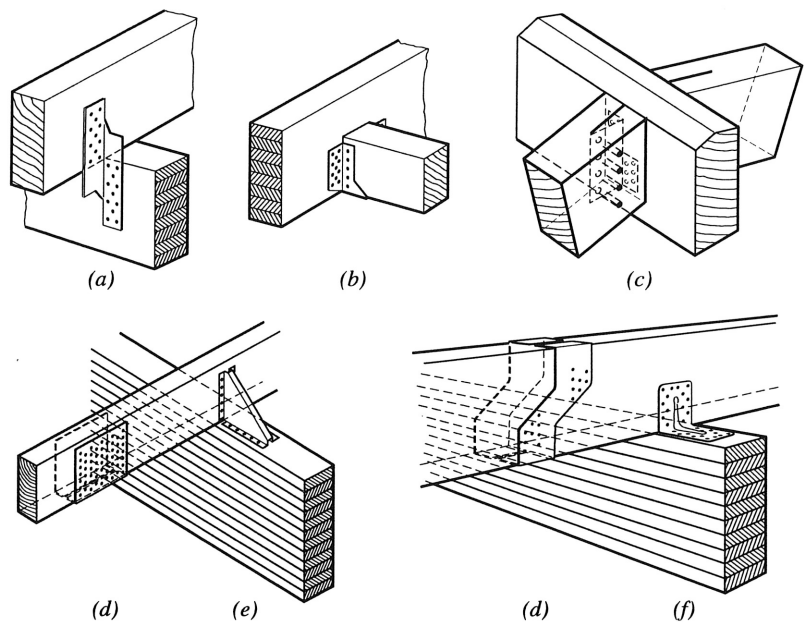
Examples of cold-formed steel fasteners. (a) framing anchor, (b) joist hanger, (c) integral fastener, (d) shear force splices, (e) cleat (f) angle bracket.
